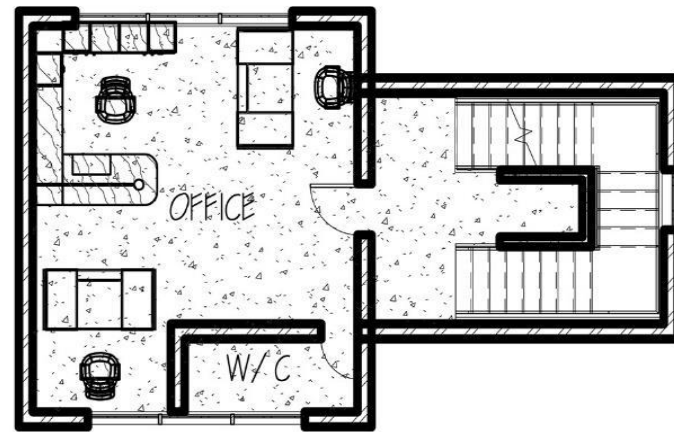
Second floor (Typical Offices Floor from 2nd-5th Floor) of the Proposed Obudu Cargo and Passenger Airport Terminal Building
